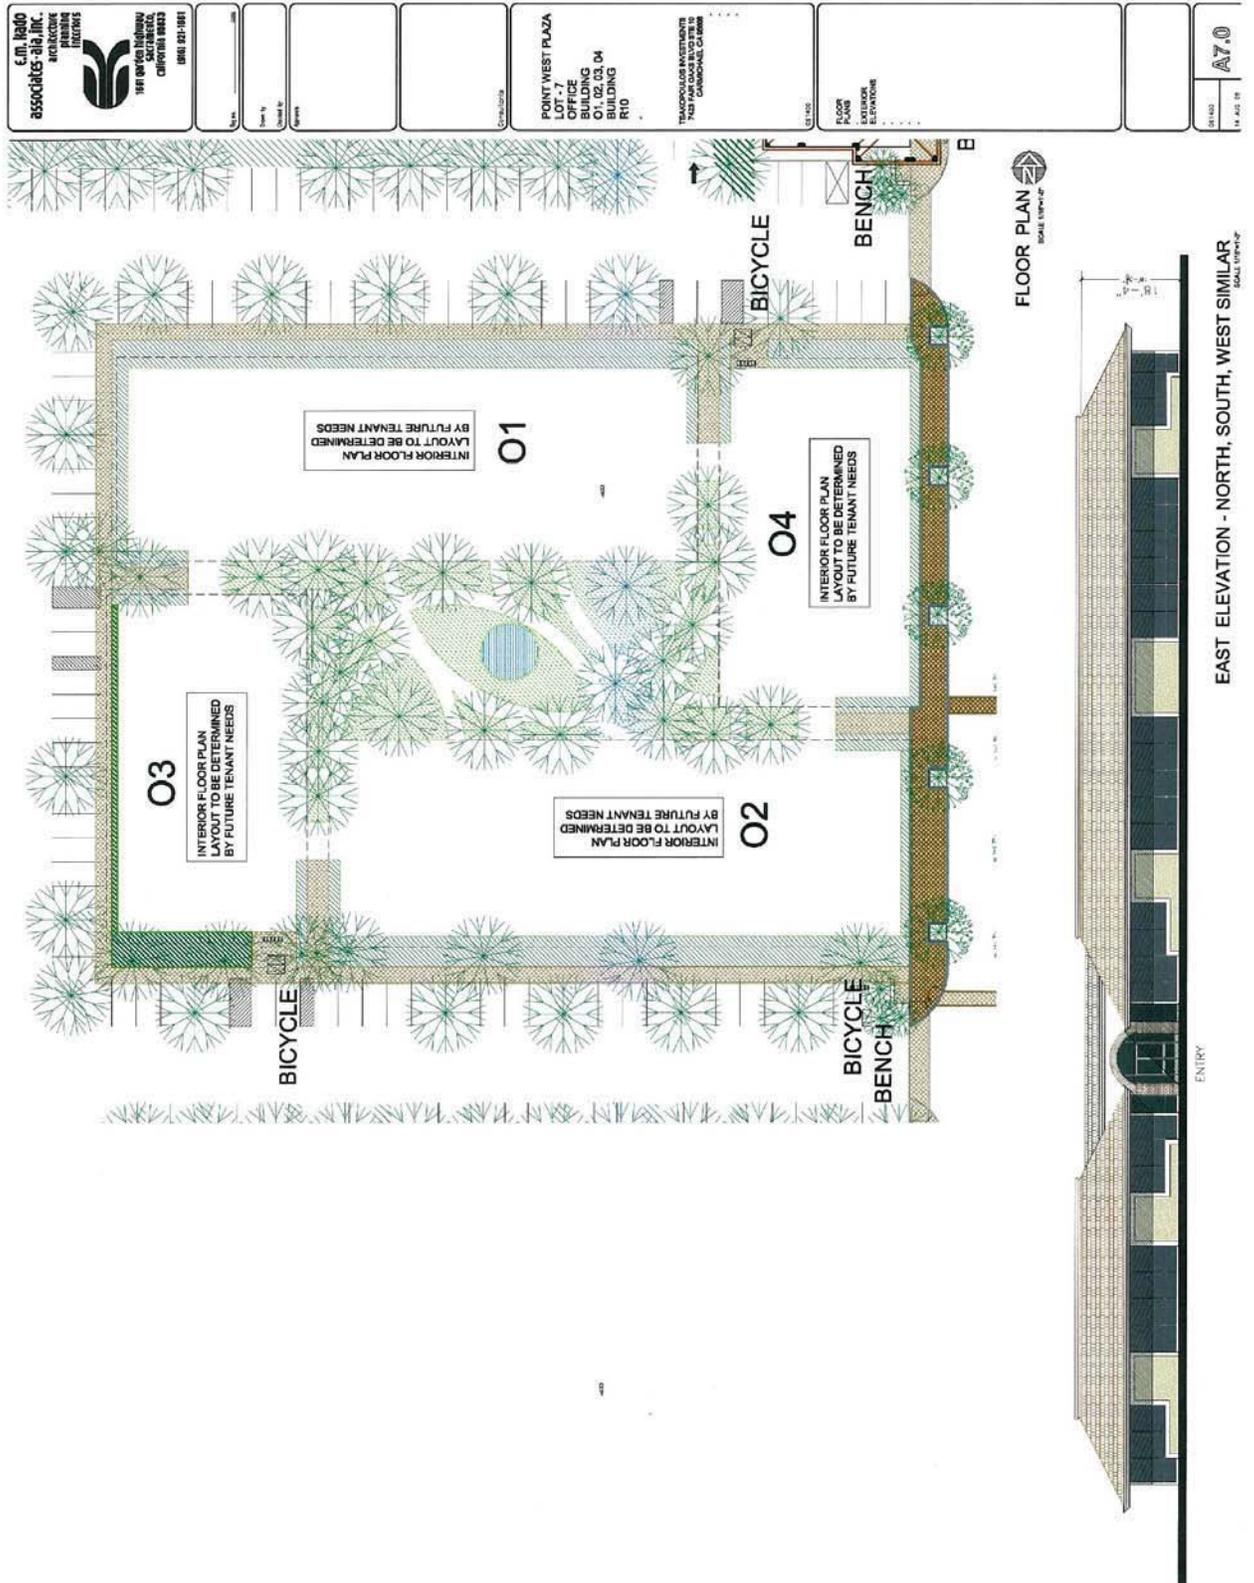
Exhibit S: Buildings O1-O4 - Floor/Elevations Plans
